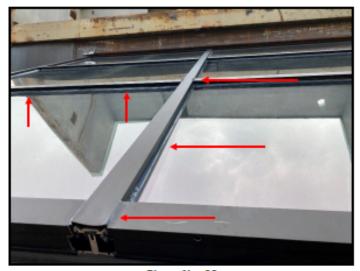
Exterior View of Sealant Applied to GlazingTrim Joinery
